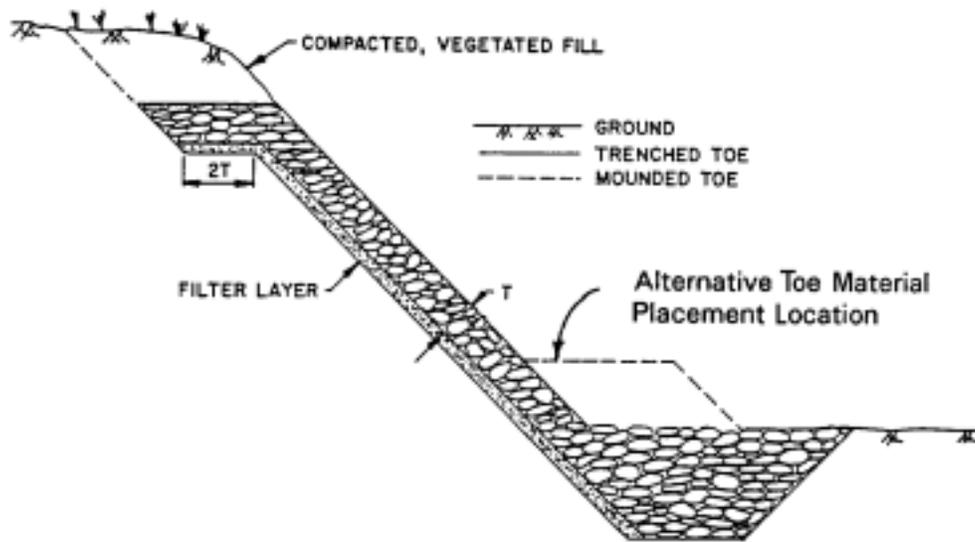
Typical Riprap Installation: End View (Bank Protection Only)
